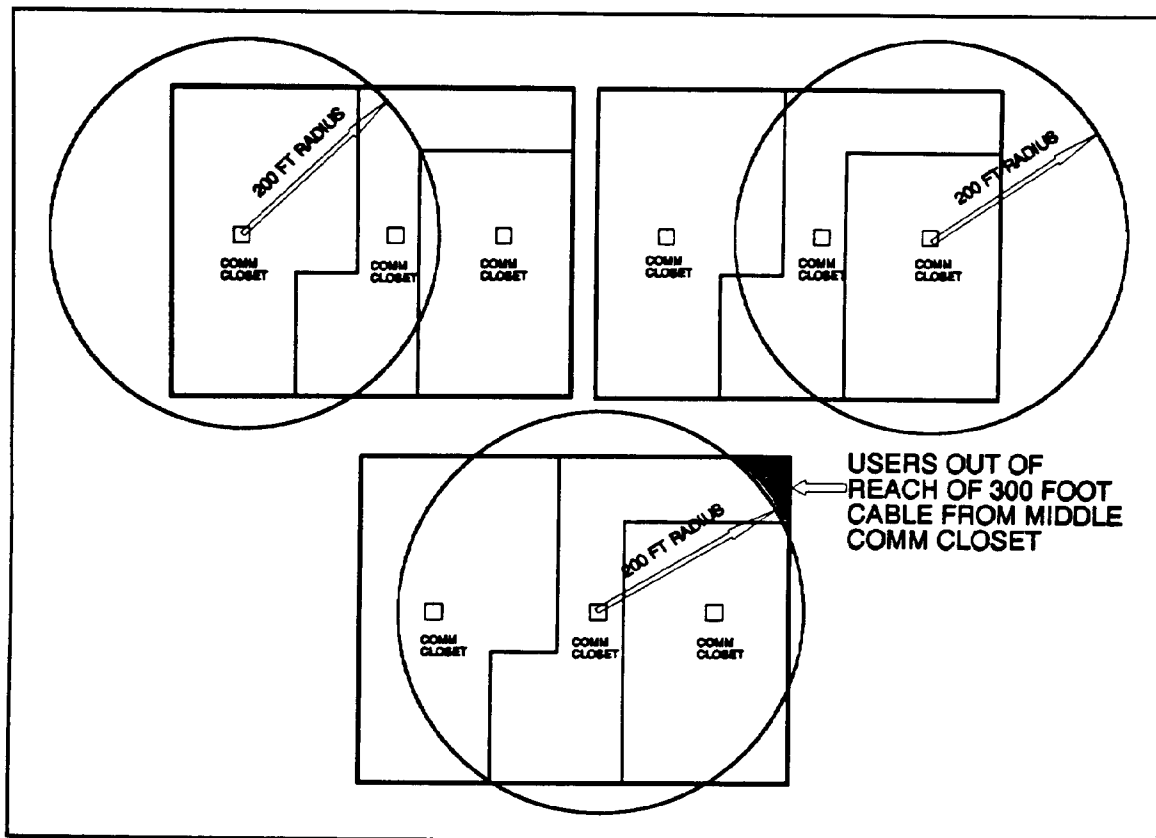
Possible floor plan with 200 foot radius circles.
